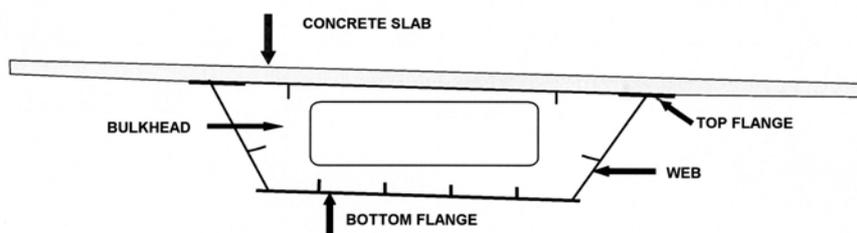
Box girder with directly supporting bulkheads and no cantilevers (pavement unidirectional banking)
